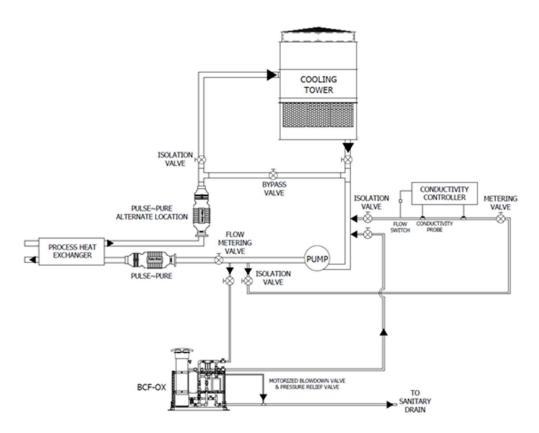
General field installed arrangement of the Pulse~Pure[®] PLUS in a system with a Single Cooling Tower with Integral Sump.
